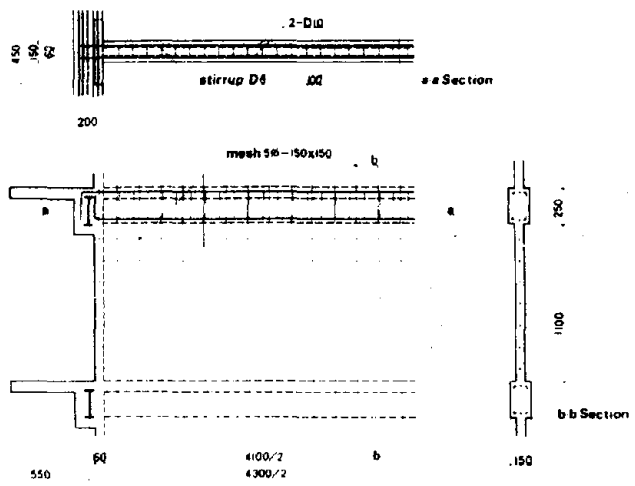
REINFORCEMENT: NONBEARING WALL
